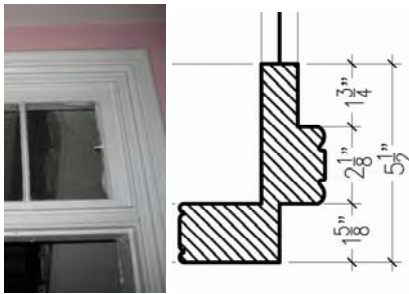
Door 203A transom type-3 photo and profile. (Photo: BBB, 2006)
